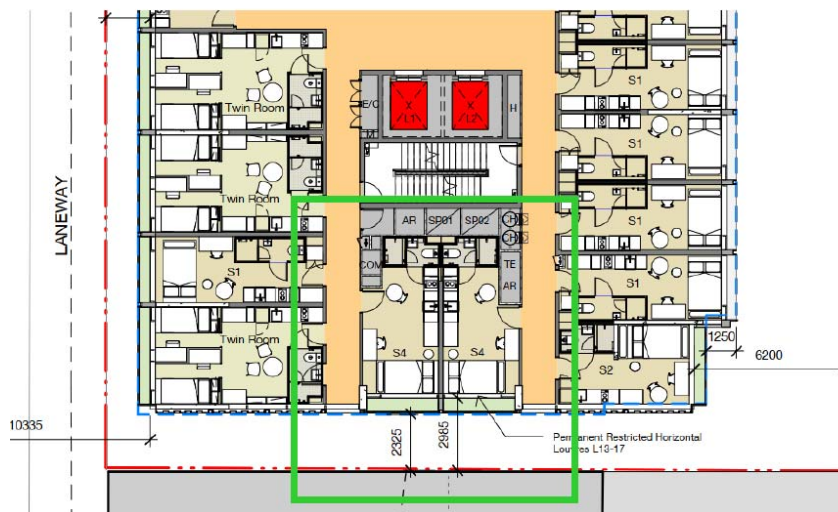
Proposed floor plan showing the twin rooms on the west boundary and the studios with windows setback 2.9m from the southern boundary.
